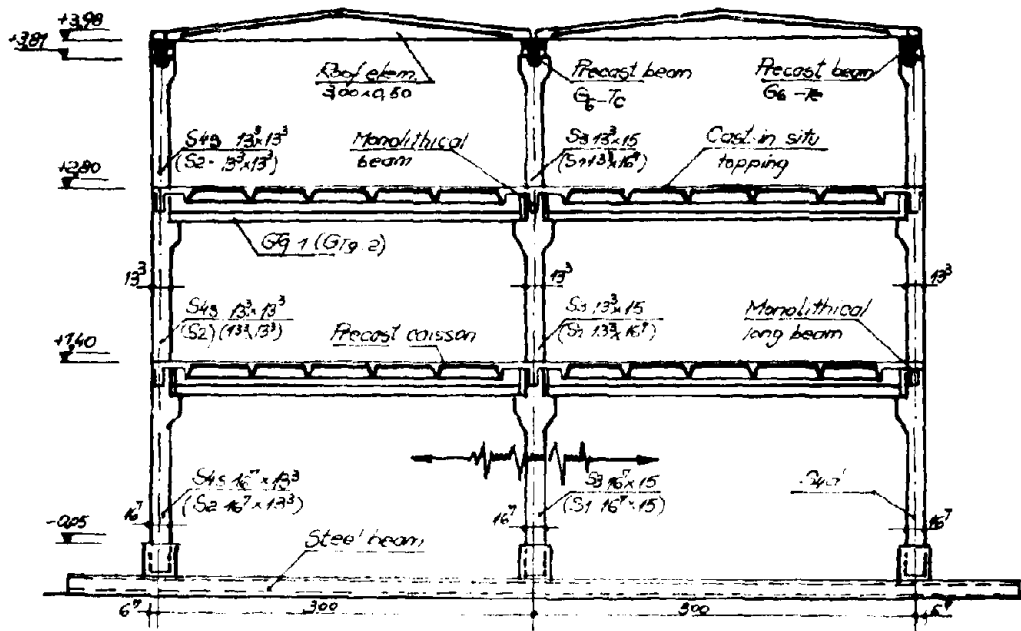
THREE STORY MODEL - TRANSVERSAL SECTION
